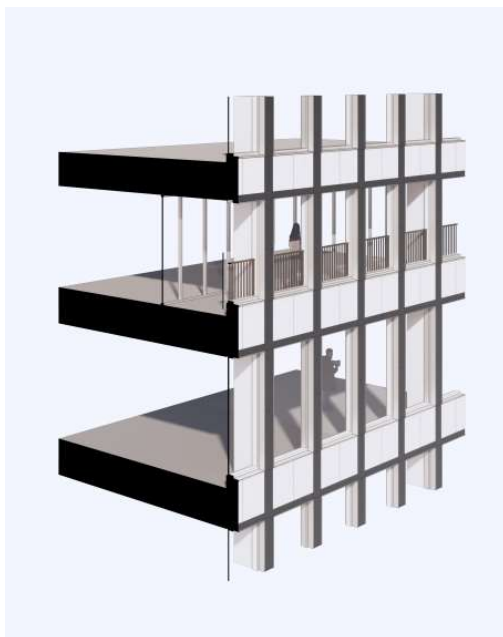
Diagram demonstrating proposed window proportions, including the framing of the openings to the balcony at level 16. (Source: Architectus)
